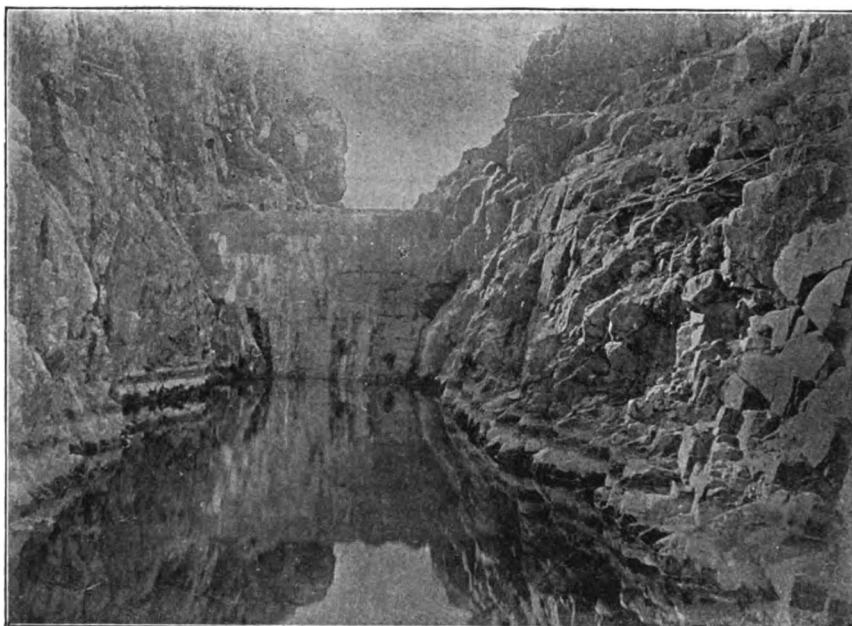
UPPER OTAY DAM, FOUNDATION MASONRY.
